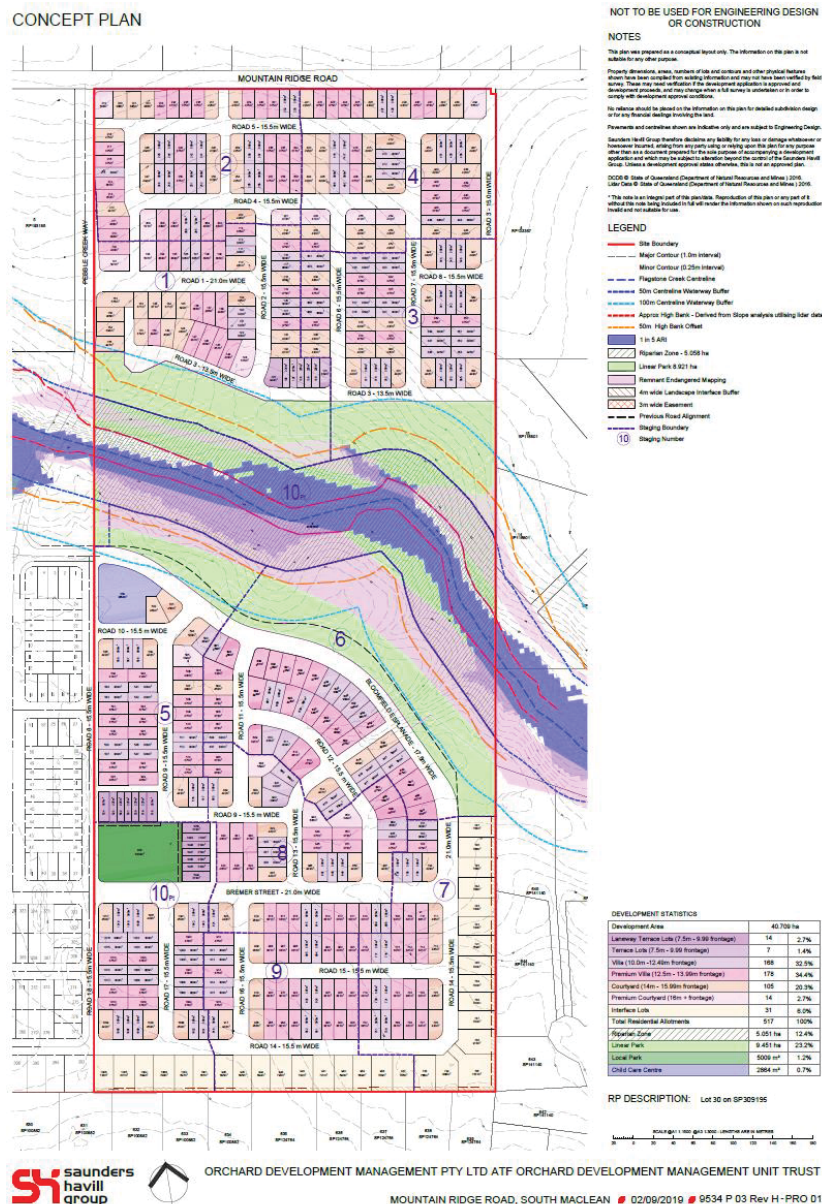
Proposed Development Layout (Source: Orchard, 2019)
